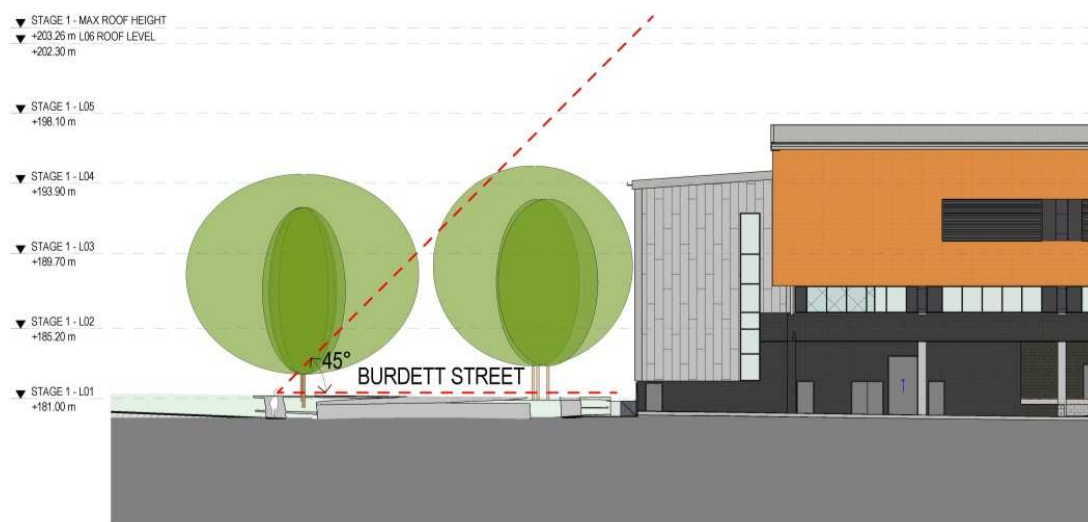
Section of person looking at Stage 1 Redevelopment from Burdett Street.
